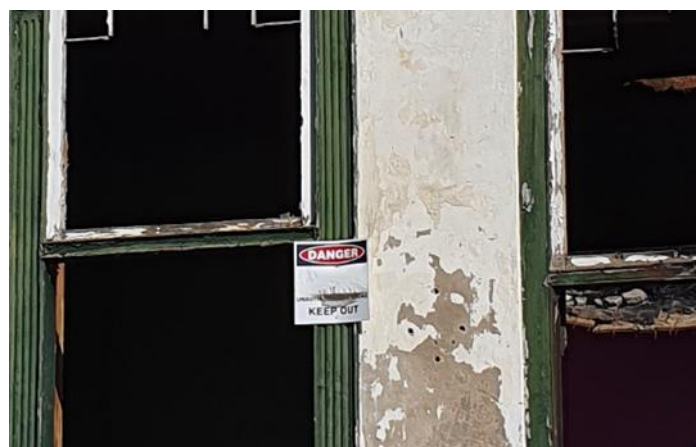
Warning note on the front wall due to the hazardous potential of the building
